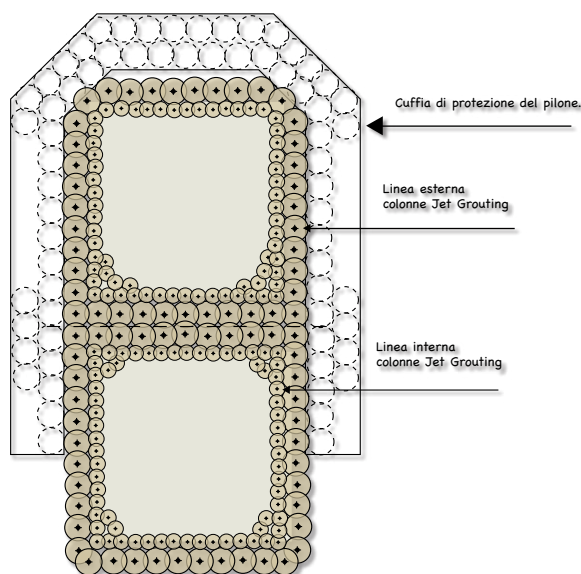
Lay-out of JEt grouting columns forming the shaft foundation.
